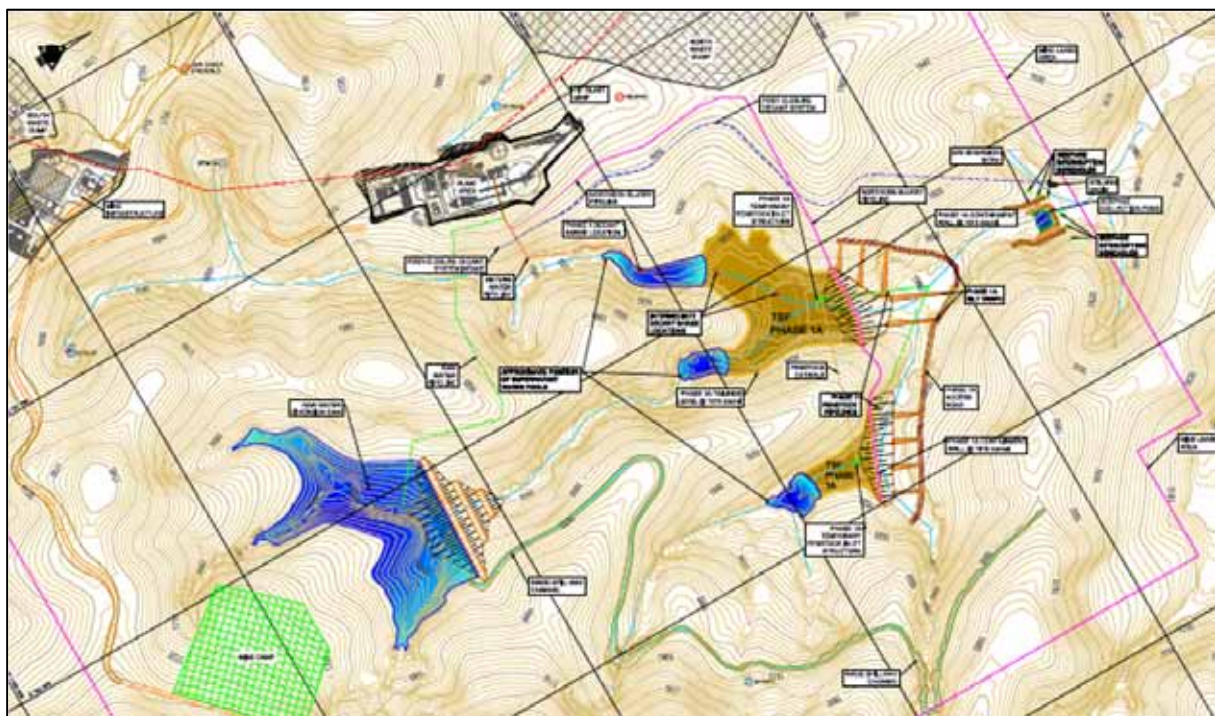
Phases 1A and 1B Starter Walls and Temporary Decant Penstocks
